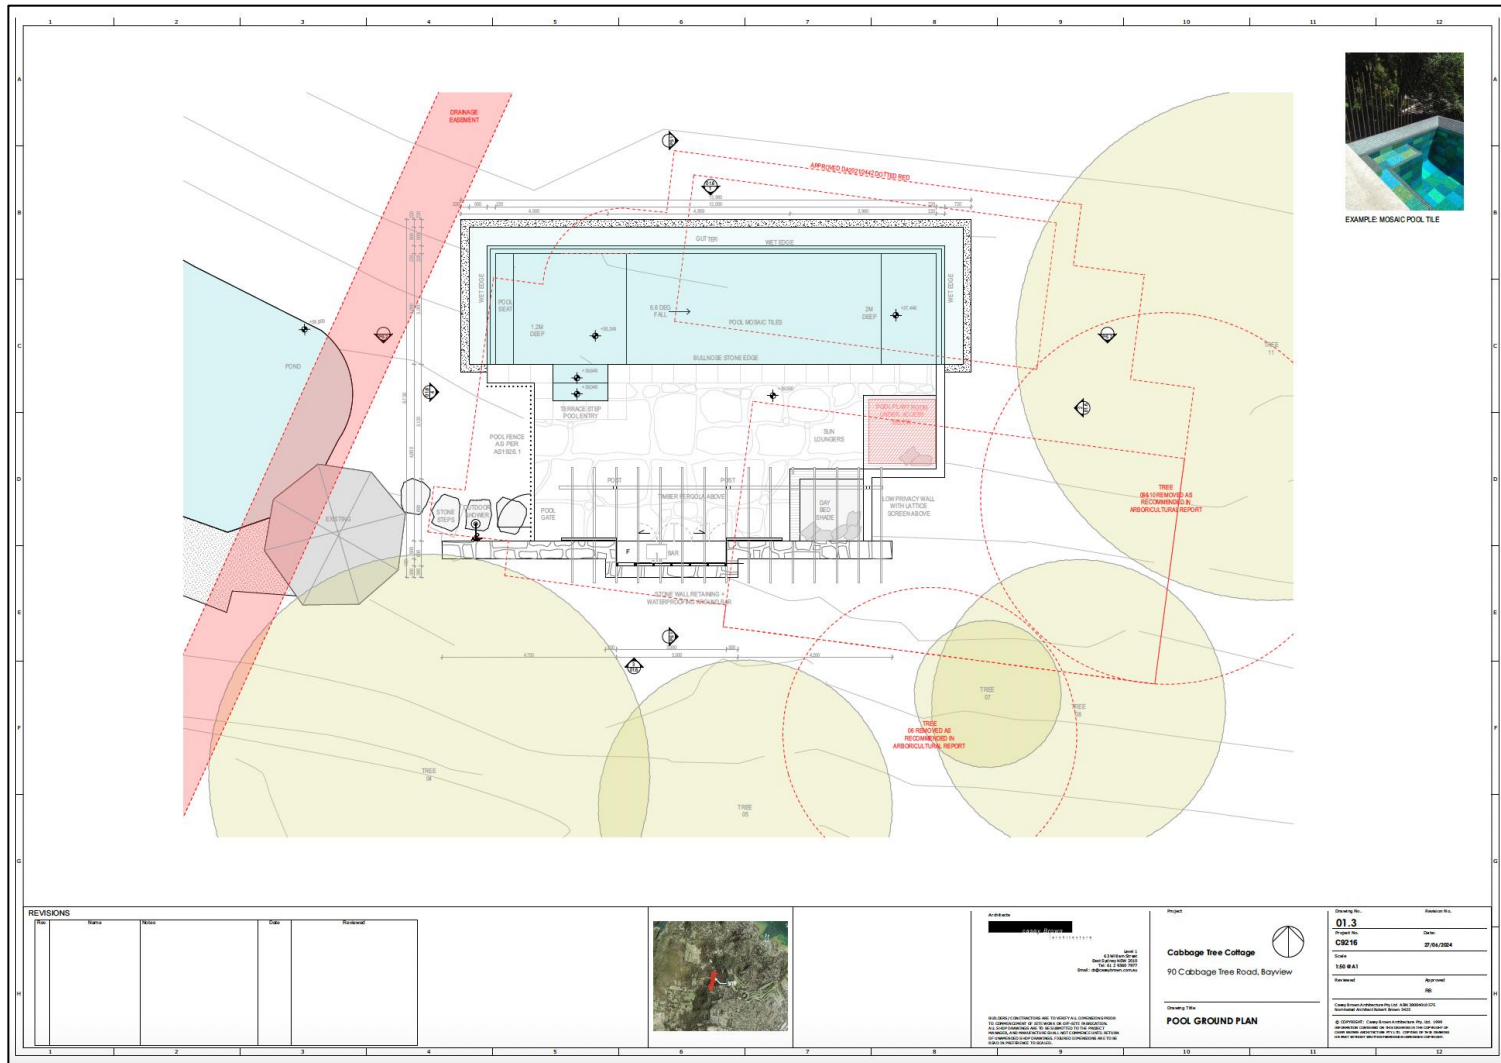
ILLUSTRATES PROPOSED GROUND FLOOR PLAN
